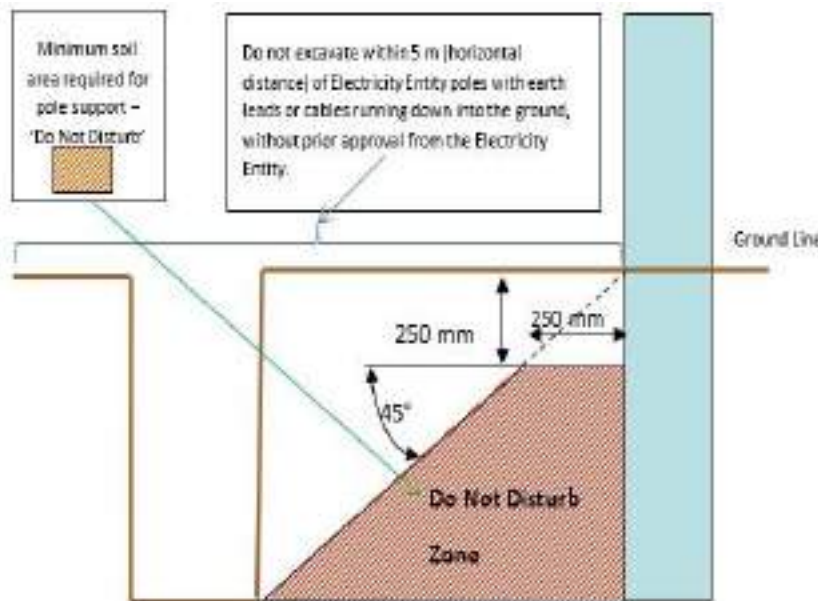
Do Not Disturb Zone requirements when excavating near poles
